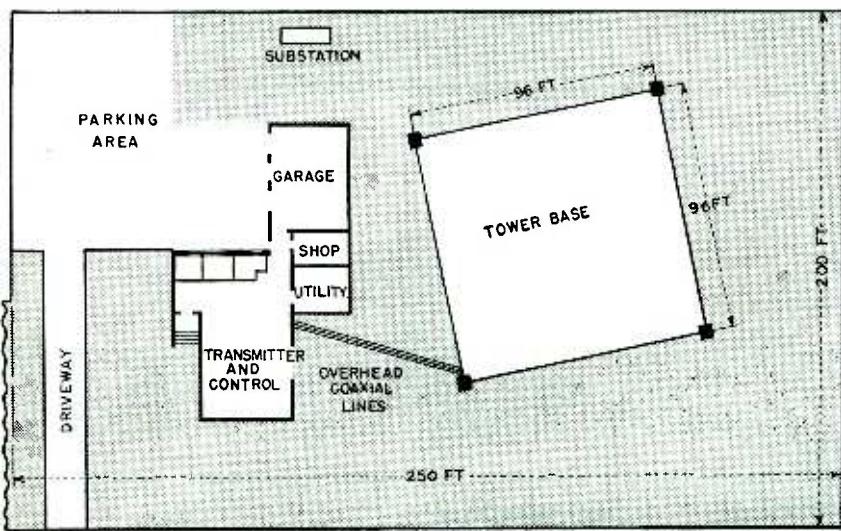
Ground plan of the North Bergen property showing relation of the tower, transmitter building and power substation
